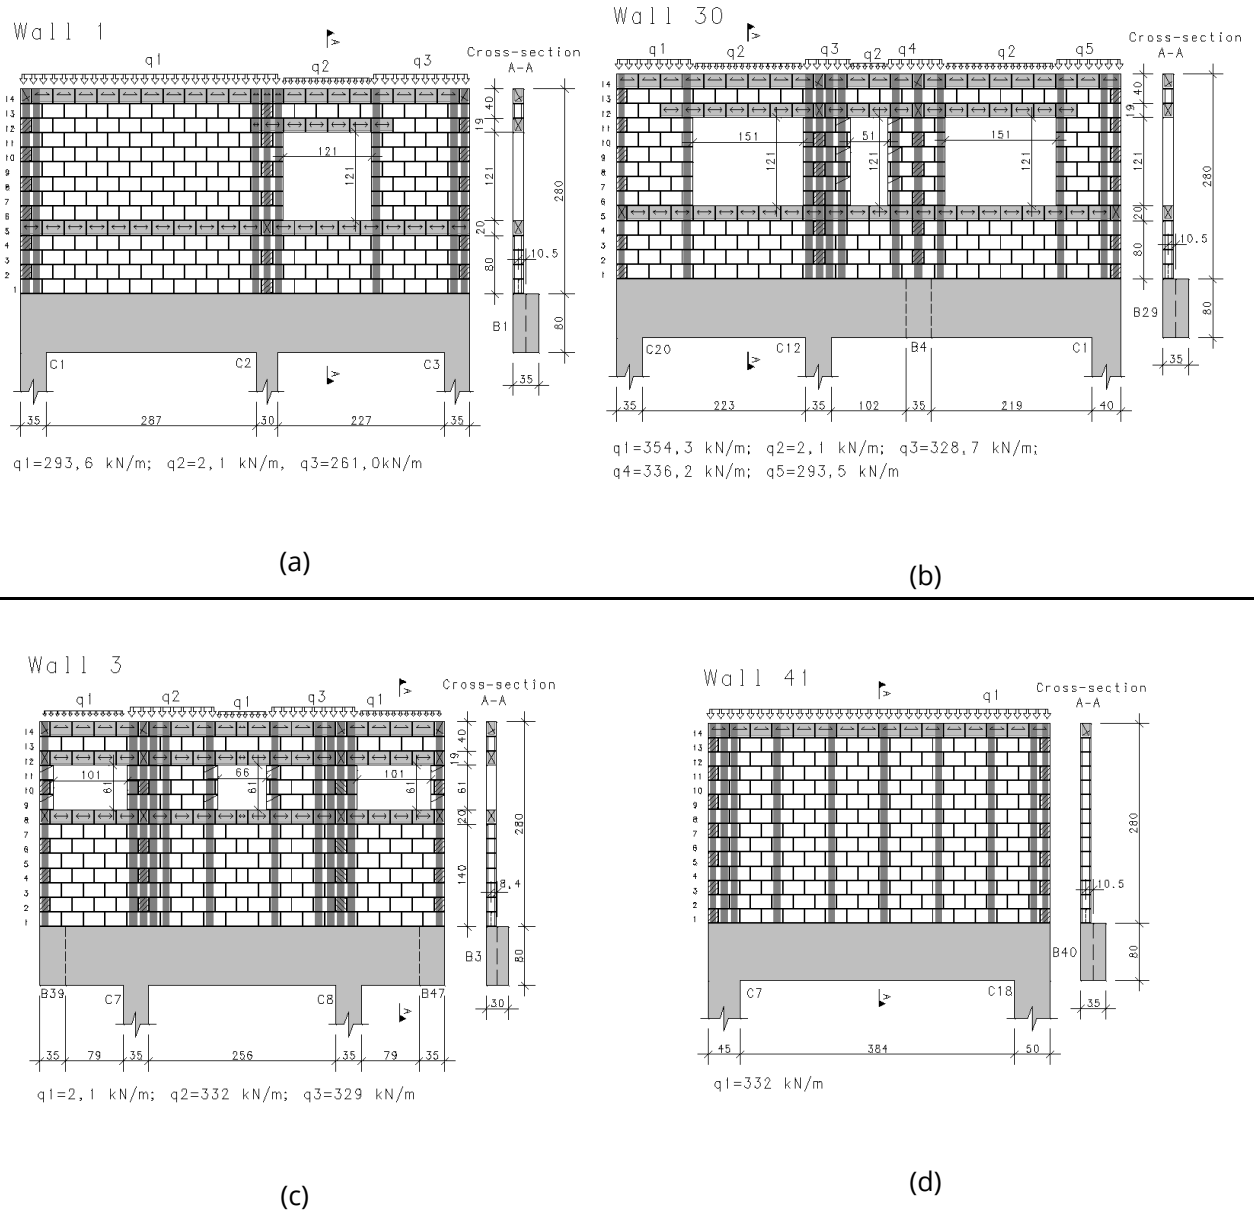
Walls details. (a) Wall 1; (b) Wall 30; (c) Wall 3; (d) Wall 41.
